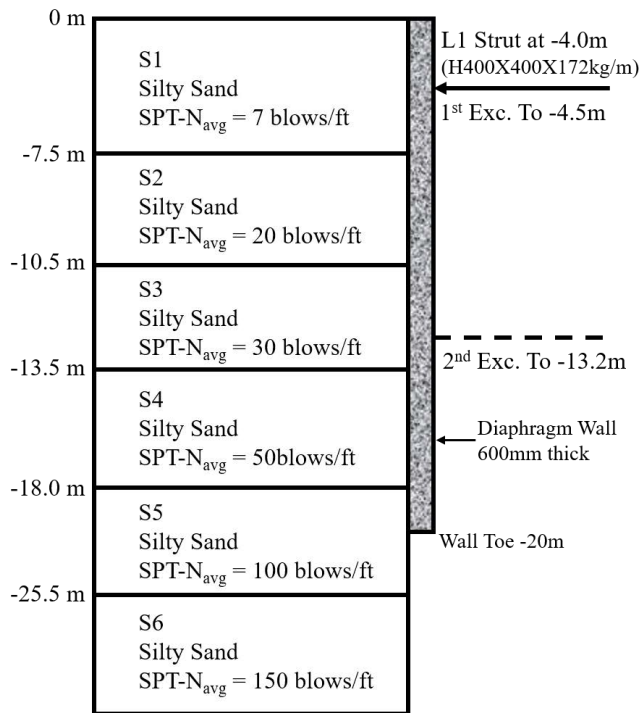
Excavation stages and soil profile in cross-section (Law et al. 2016)
